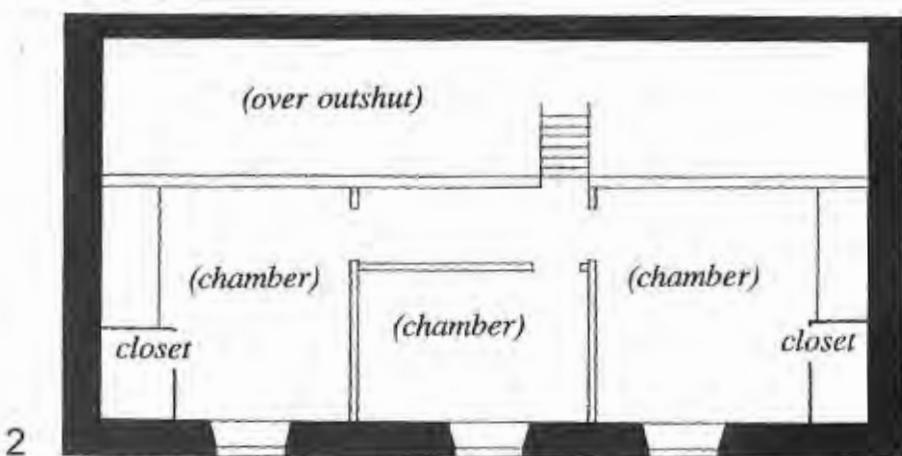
Plan of Moxhayes, Membury, showing layout of late 17th century 2-room cottage.
